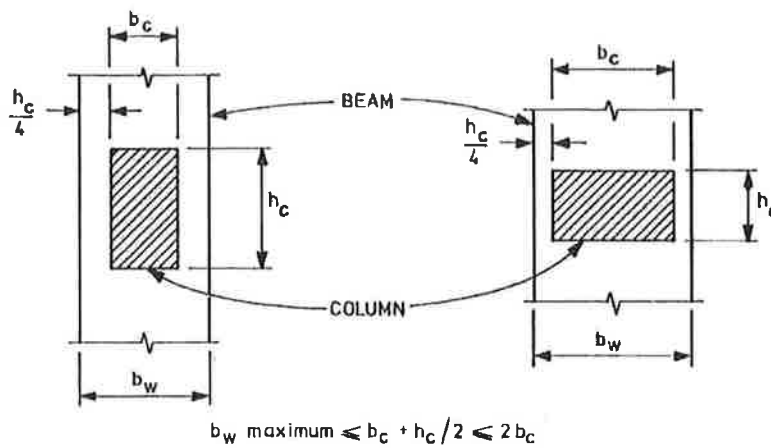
SUGGESTED MAXIMUM WIDTH OF BEAMS
